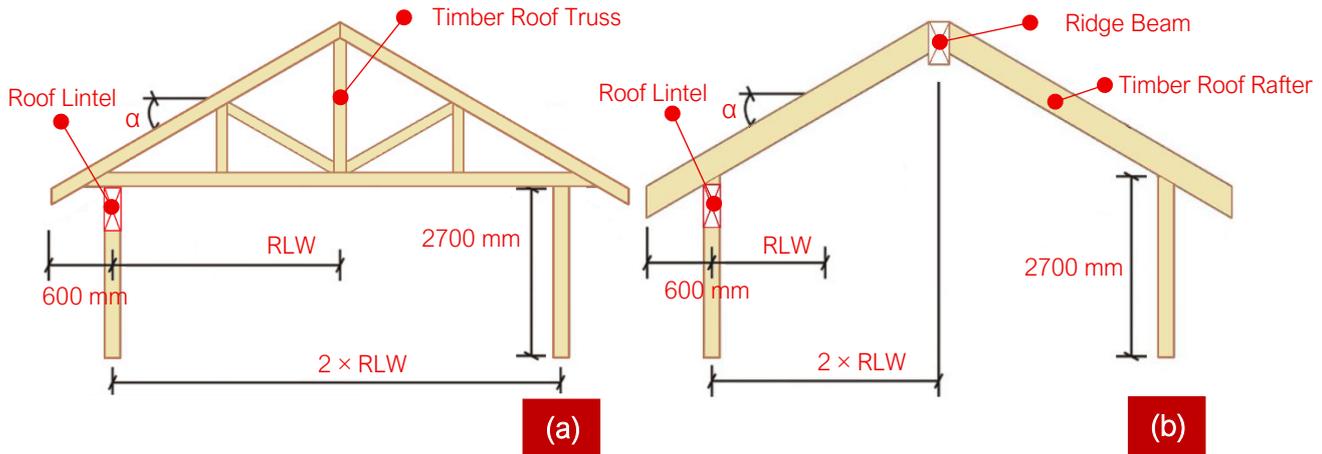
Red Stag Vertix₂₀ roof lintel beam; a) Timber roof truss, b) Timber roof rafter.
